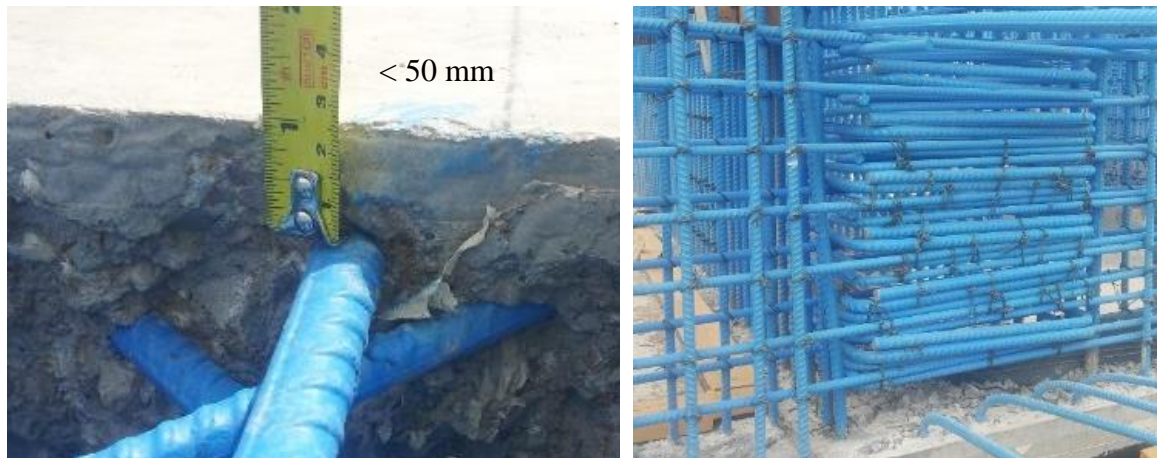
Non-adequate concrete cover in concrete slab (left) and congestion of reinforcement in a junction of a T-wall (right) reinforced with epoxy coated bars (Al-Amerat/Oman-2013).
